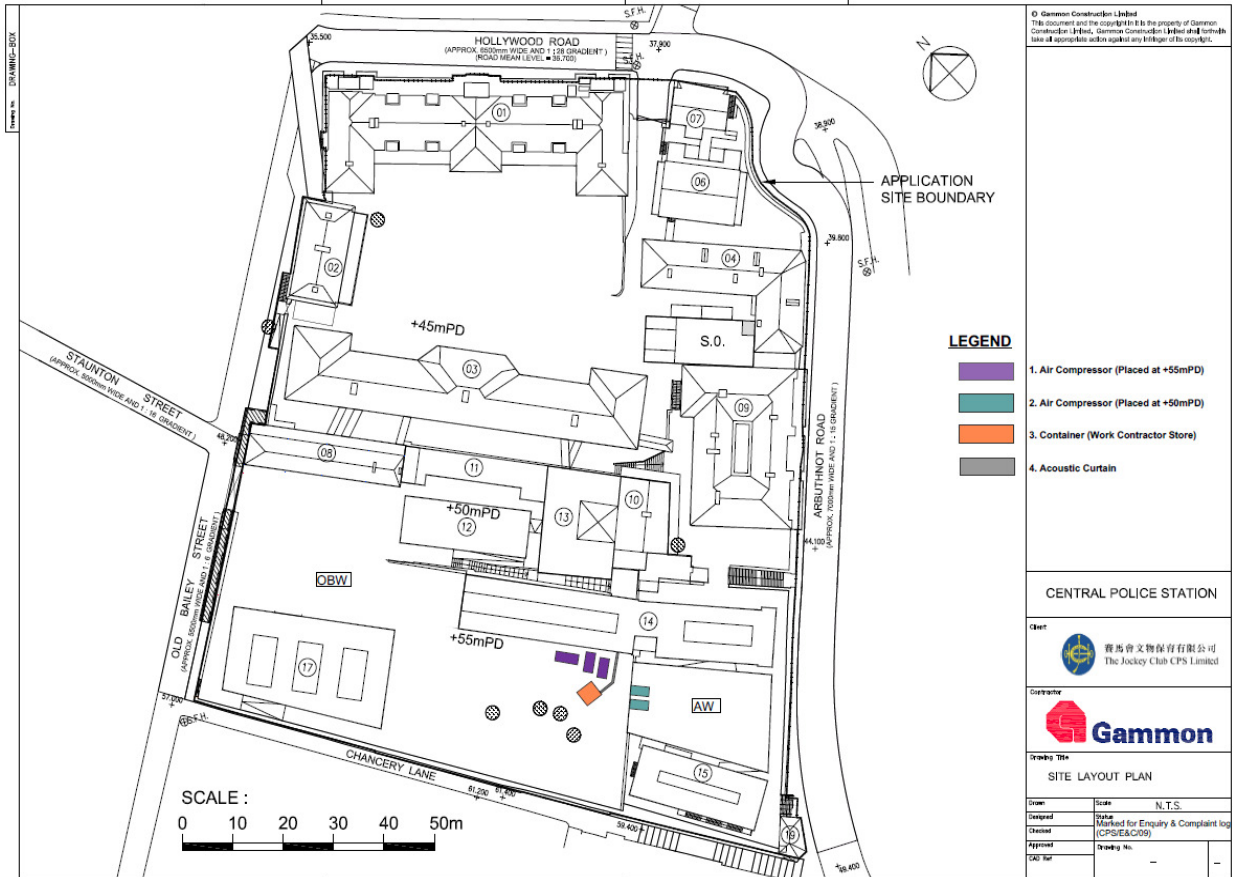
Site layout plan showing locations of air compressors and noise barrier
